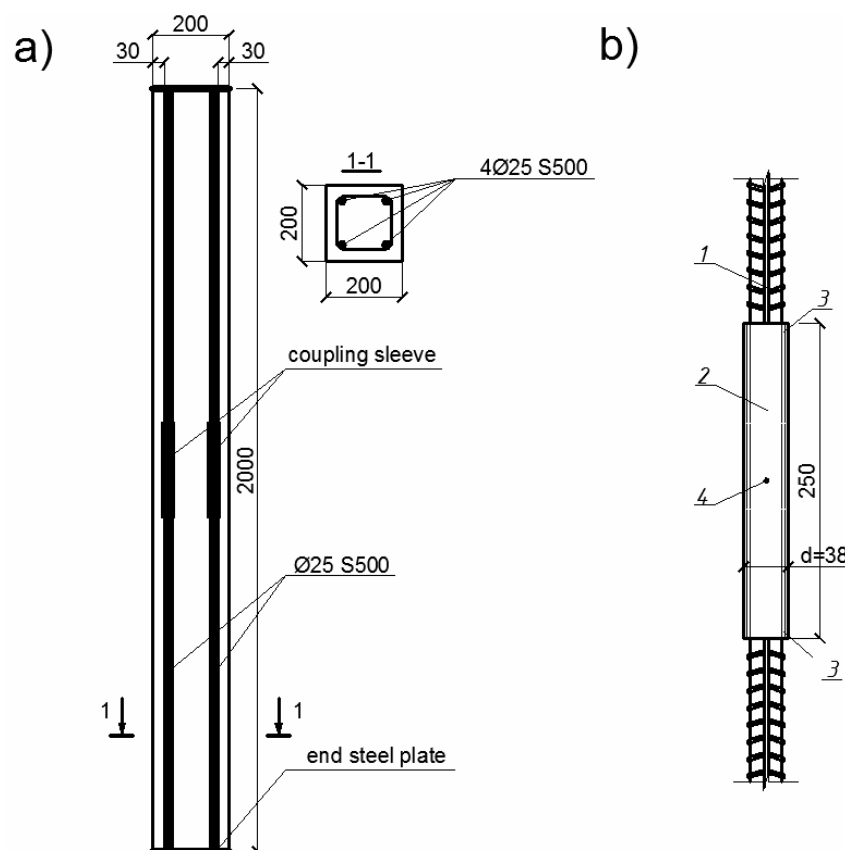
a) Scheme of longitudinal reinforcement samples columns; b) construction coupler connection reinforcement bars:
